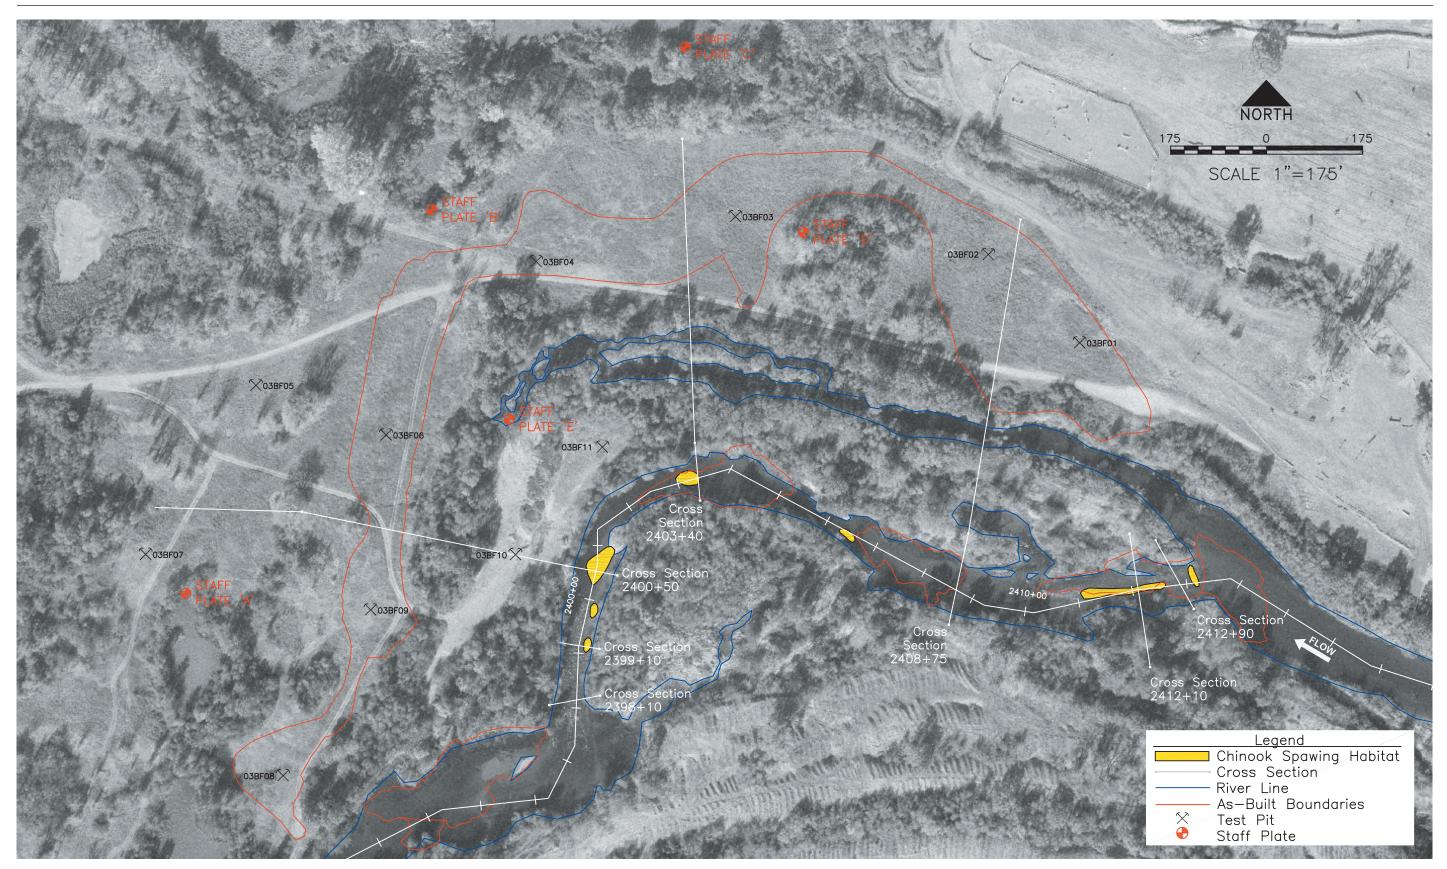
Pre-construction cross sections, ground water monitoring sites, material test pit locations, and Chinook spawning habitat areas.
